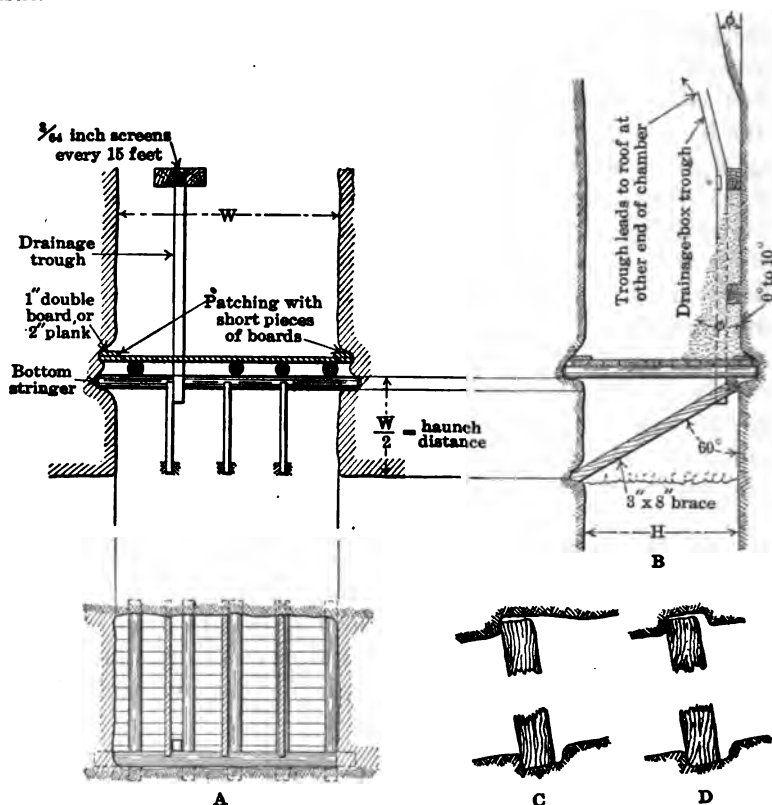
Bulkhead and hitches for flat workings. A, plan view and front elevation; B, side elevation; C, prop held by a sliding and a trough hitch; D, prop held by trough hitches.
